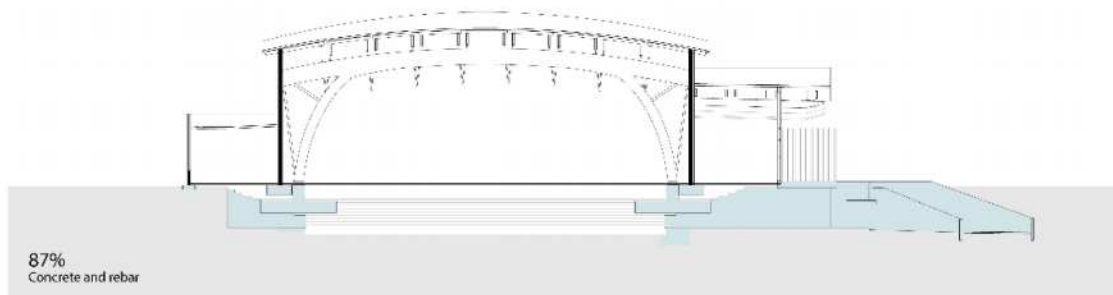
ICCU Arena section highlighting concrete use (in blue).
